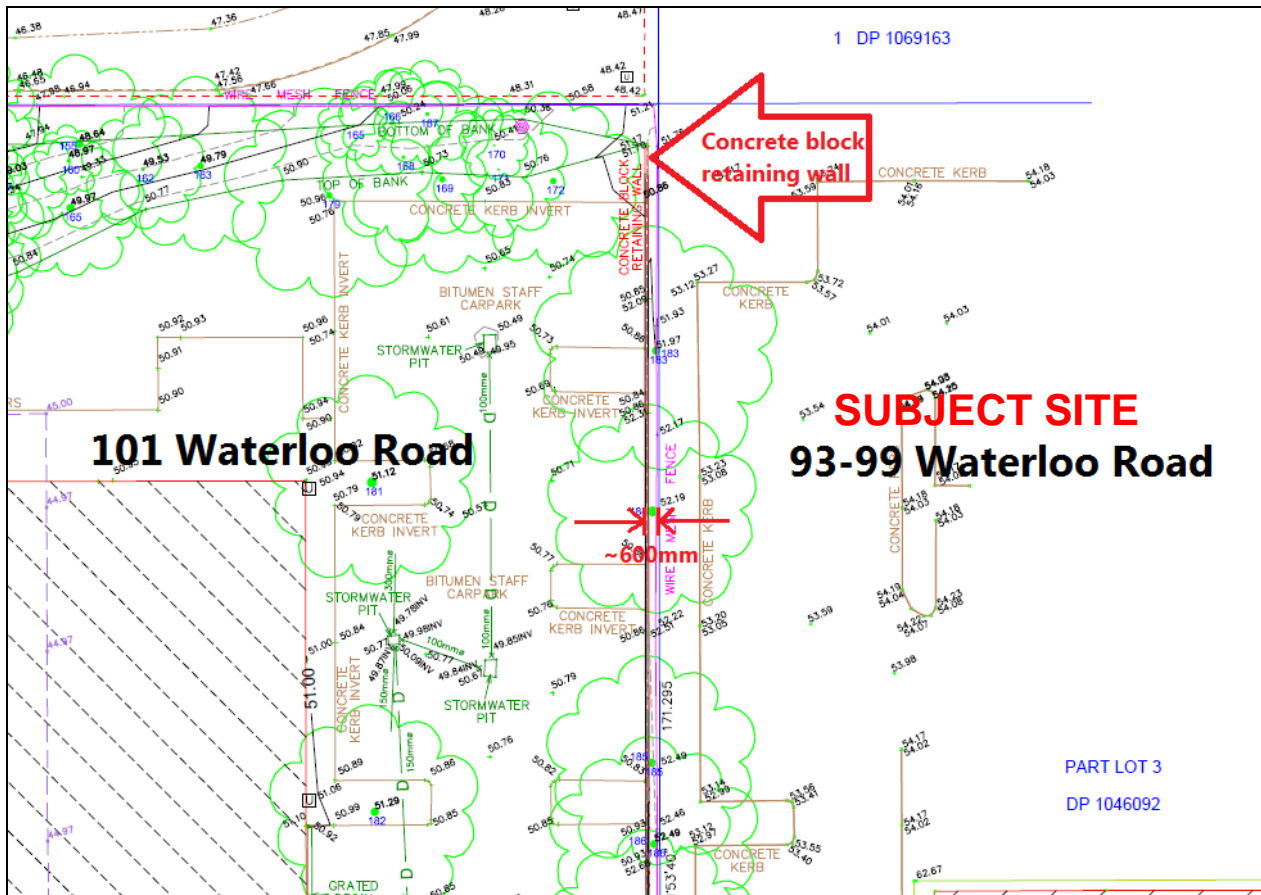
Excerpt of Survey Plan identifying location of encroaching retaining wall along the western boundary.
